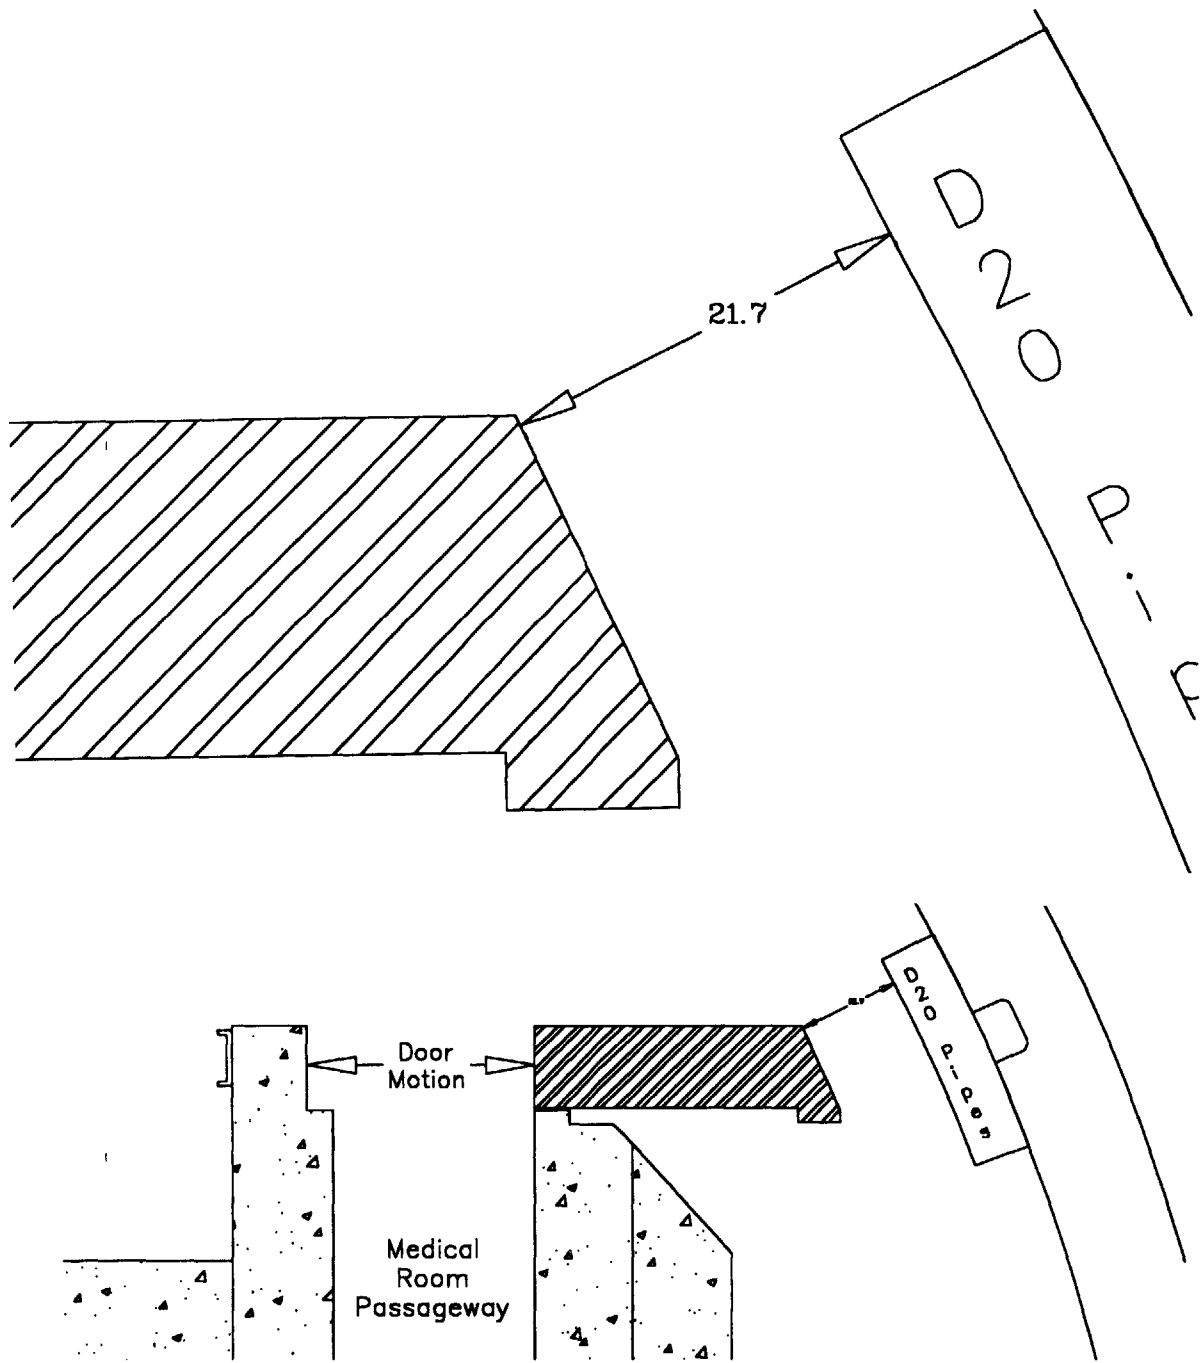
Chamfered Sliding Door – Plan View, Open Position (support structure for door not shown).
